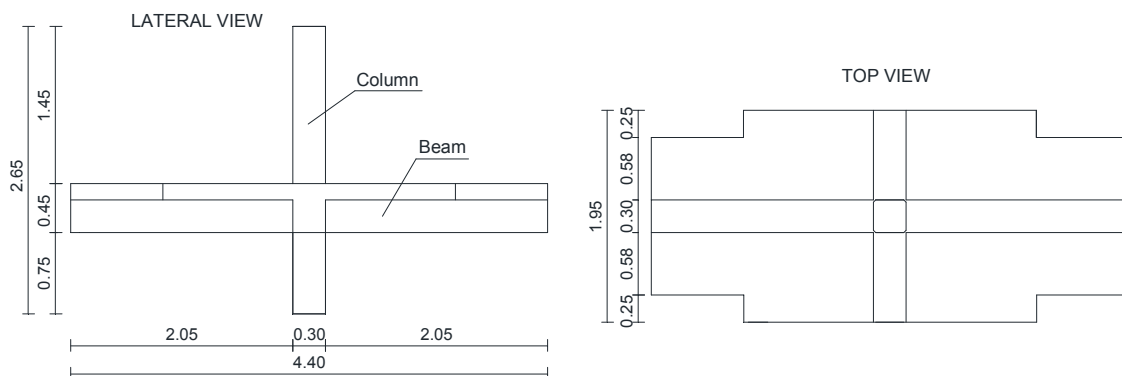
Full-scale beam-column joint specimens to be tested at the University of Aveiro laboratory facilities (dimensions in meters)
